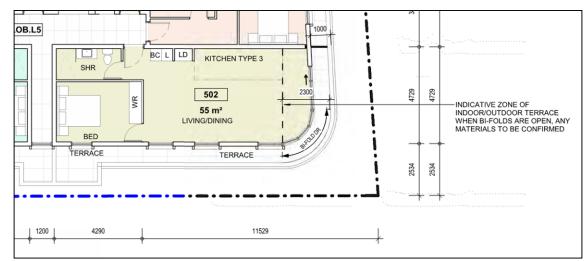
Extract of Level 5 Floor Plan (Source: BN Architecture).
